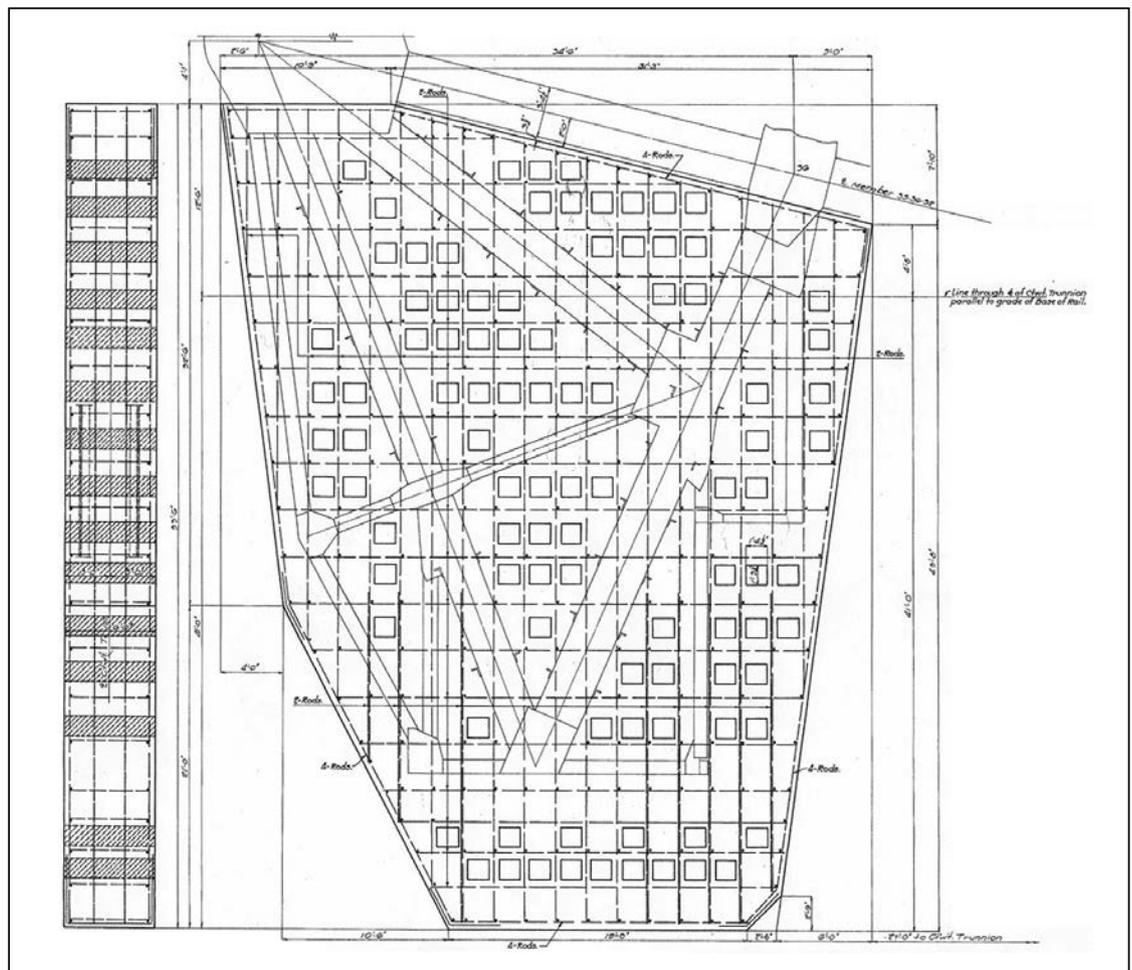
Revised counterweight design for the shortened bridge, 1930
